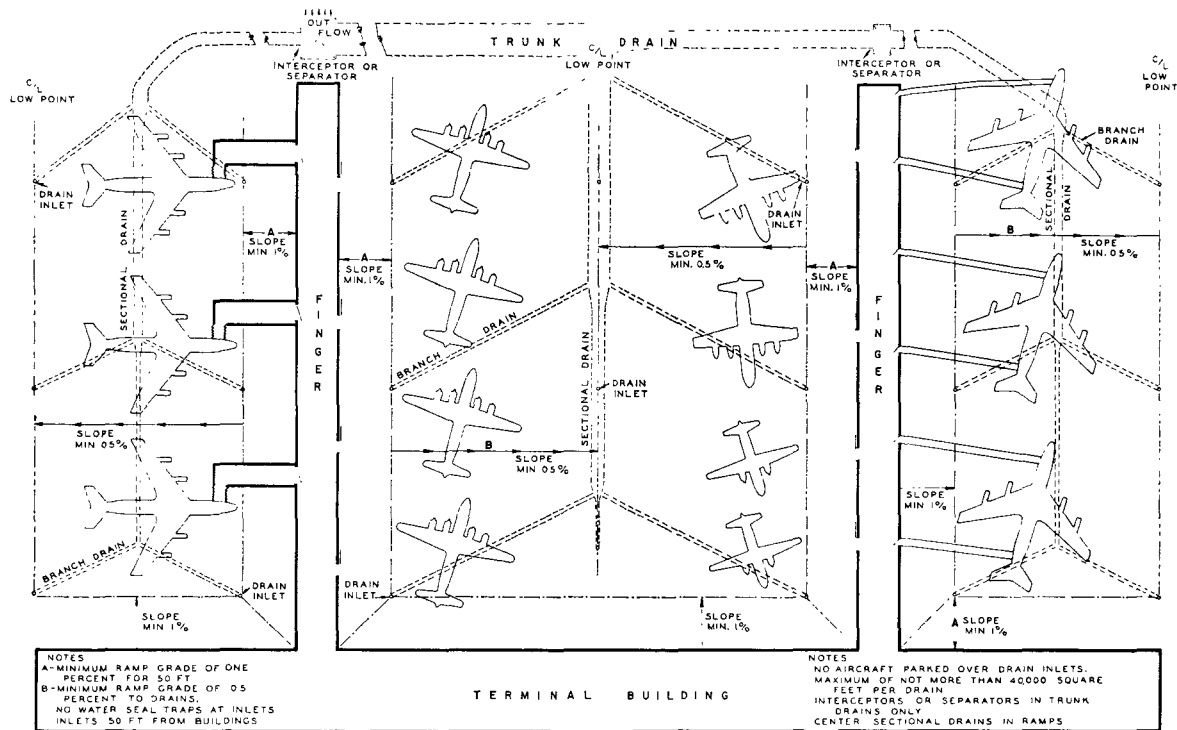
Another possible arrangement of an aircraft fueling ramp drainage system using drainage inlets without the optional water seal traps.
